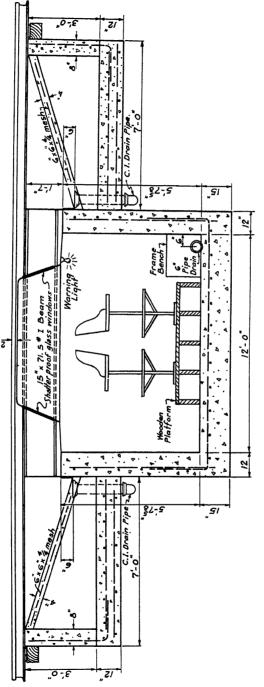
Cross Section of Santa Fe Pit (As originally constructed).
